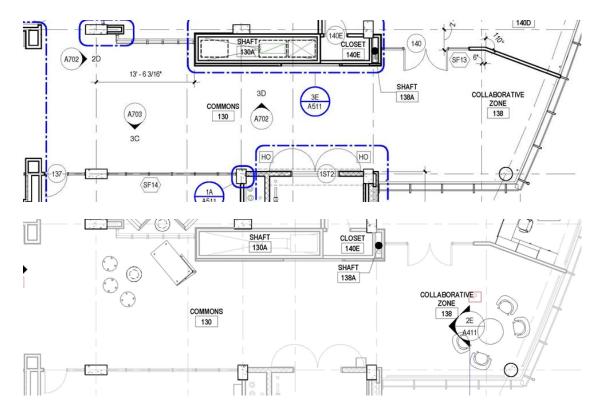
| 1st Floor Commons Floor and Furniture Plans
